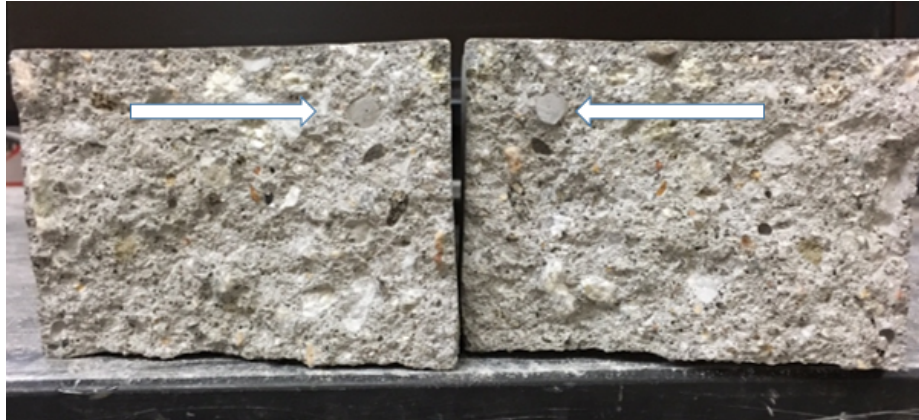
Failure at steel-concrete plane. The right arrow indicates rebar protruding from concrete, the left arrow indicates where the steel left a circular mark in the concrete.
